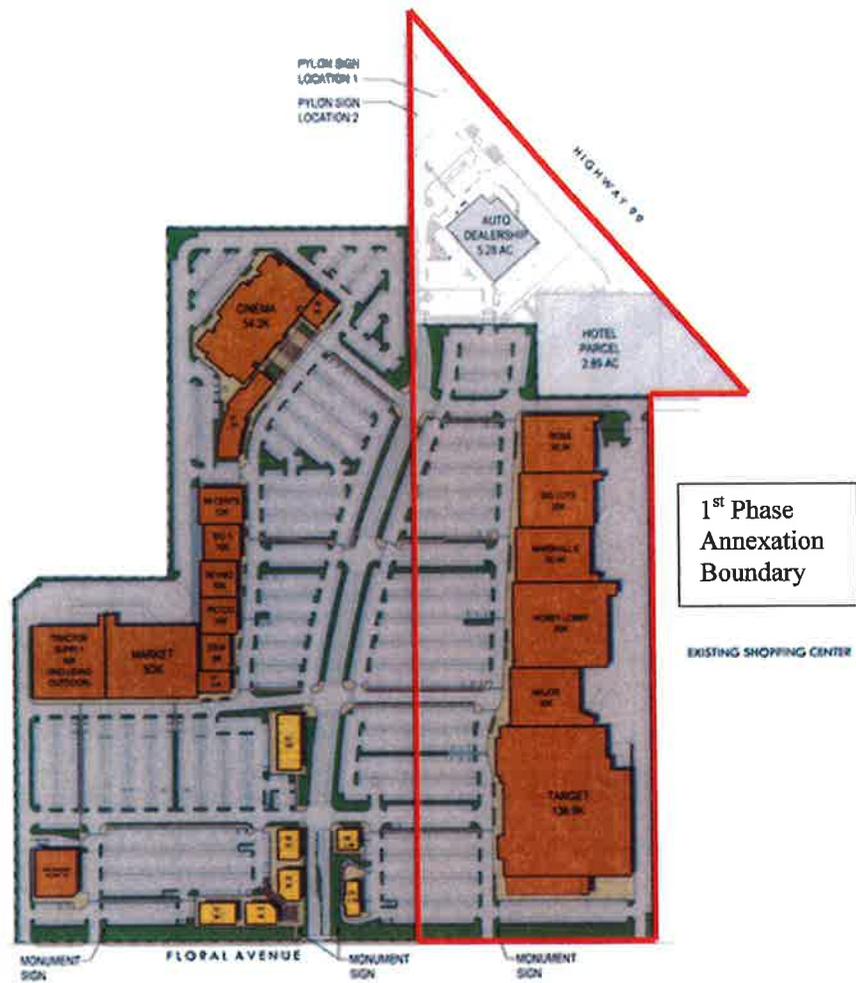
REVISED SELMA GROVE SITE PLAN AND PROPOSED FIRST PHASE ANNEXATION
